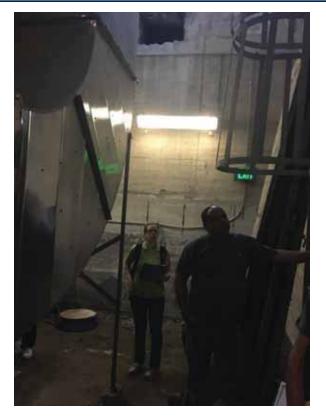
Roofed areaway (former ice storage tower) from sub-basement to rear parking area
